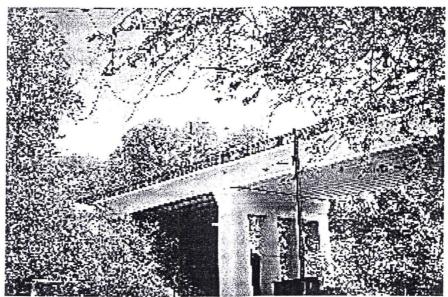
Philadelphia Walnut Lane Bridge 1988.
